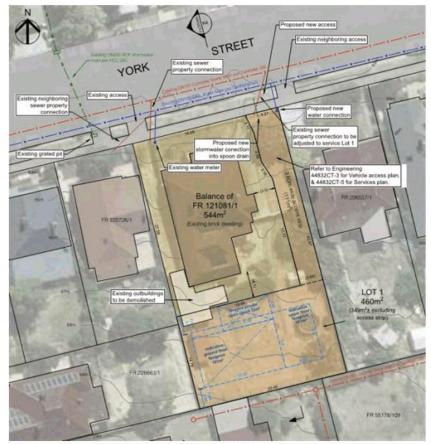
the proposed subdivision at 118 York Street, Sandy Bay.
